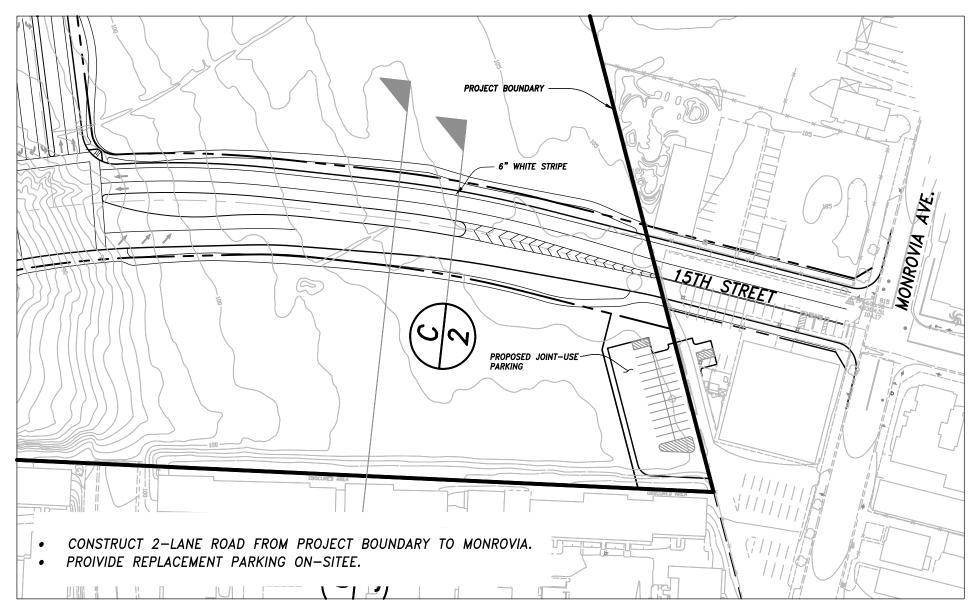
15th Street Entry and Off-Site Improvements
